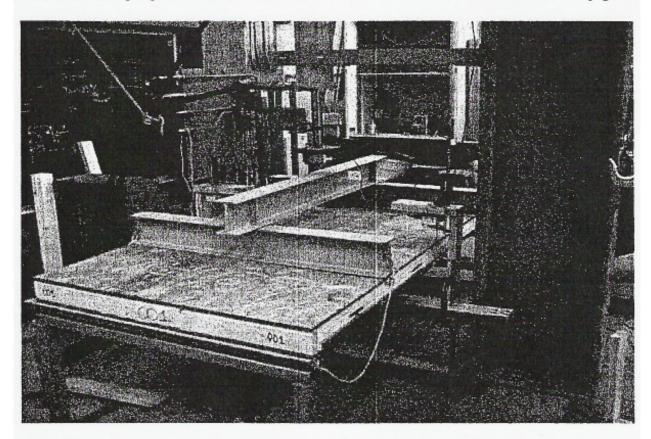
Test Setup for Transverse Loading on 8' OSB-OSB Panel
